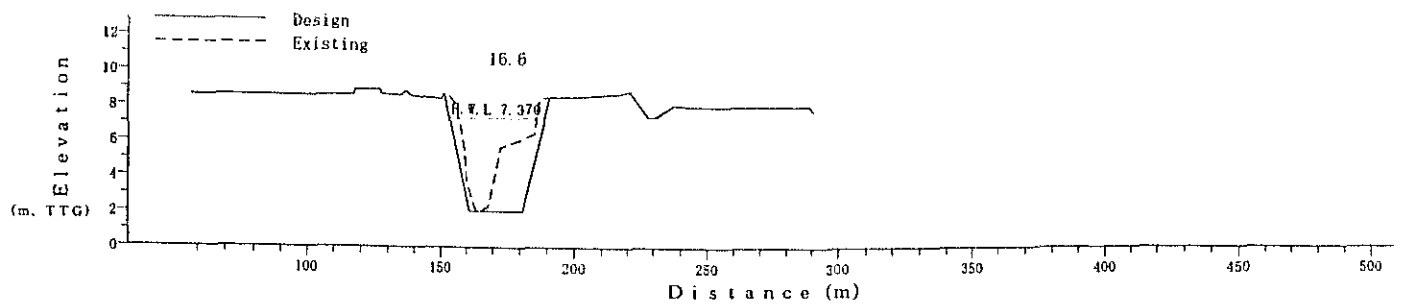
PROPOSED DESIGN CROSS SECTION OF WBC (13/13)
